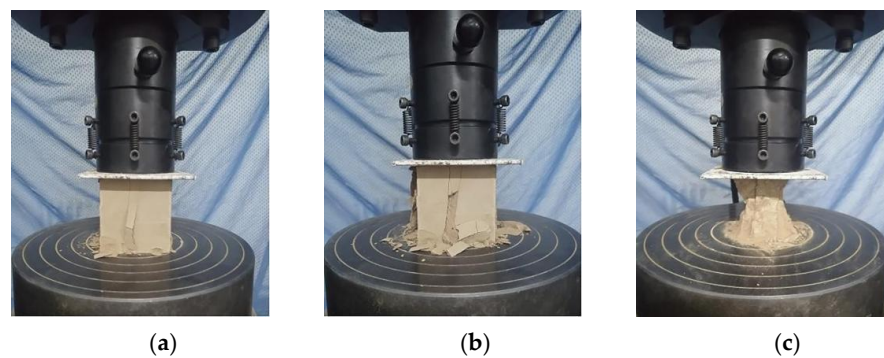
Test typical mode of failure in uniaxial compression for a cubic specimen: (a) middle stage of loading; (b) load to peak load; and (c) failure stage.
